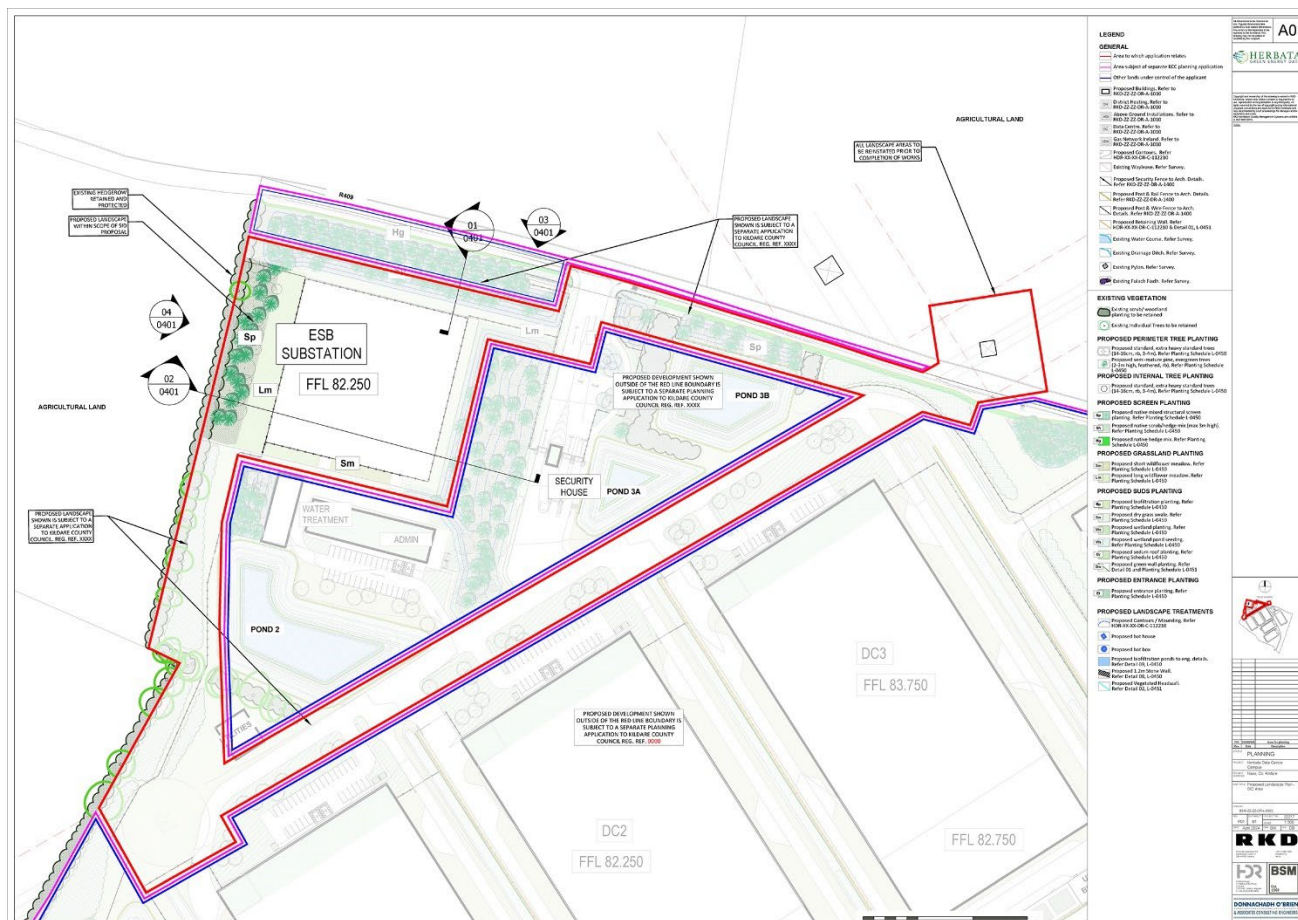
Landscape Plan to Substation Refer drawing BSM-ZZ-ZZ-DR-L-0302_LandscapePlanSID
